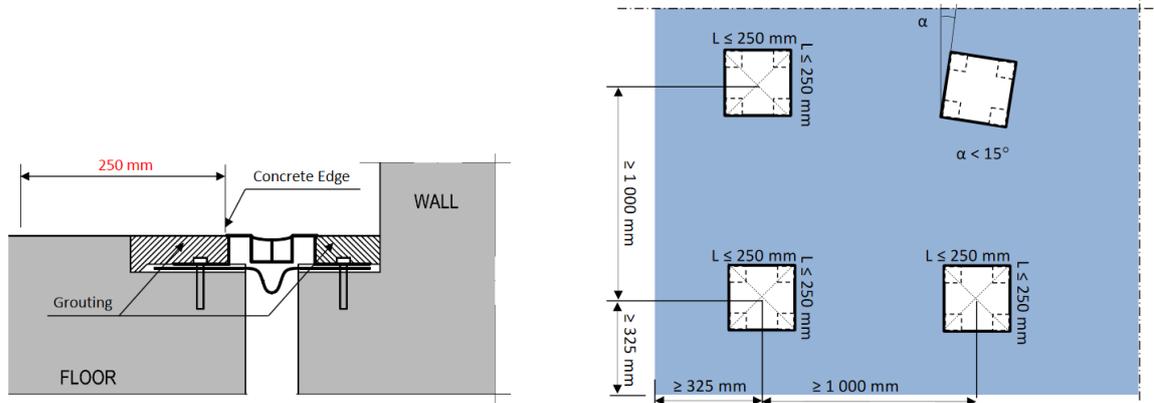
Minimum drilling distance from concrete edge for a) hammer drill and b) core drill with anchor plates
